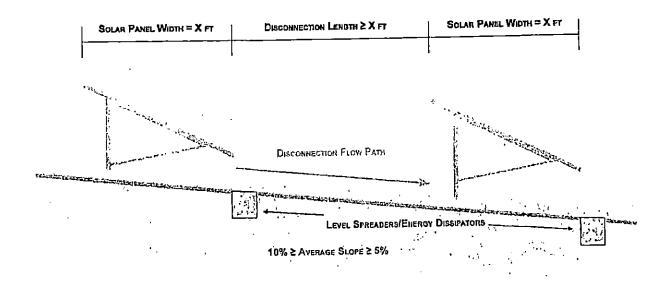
Typical Installation – Slope ≥ 5% but ≤ 10%
